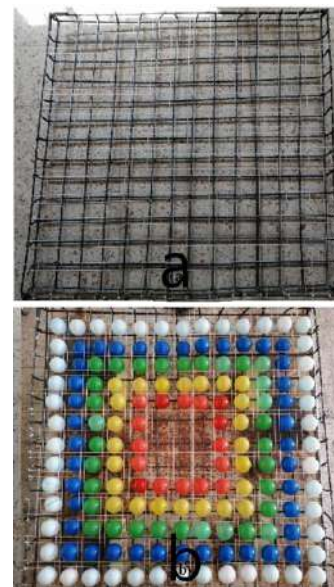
(a) The layout of bending bars in the specimens for determining spacing and scaling with the string, as well as (b) the S_1 void slab specimen
